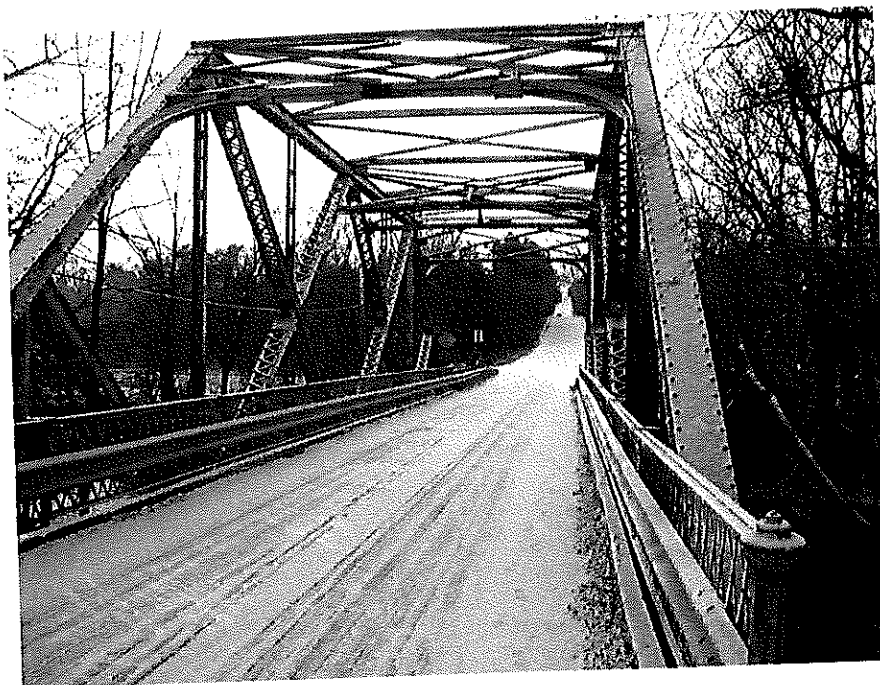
Collingwood Street Bridge (Bridge #000141) looking South from the North Edge of the Bridge
